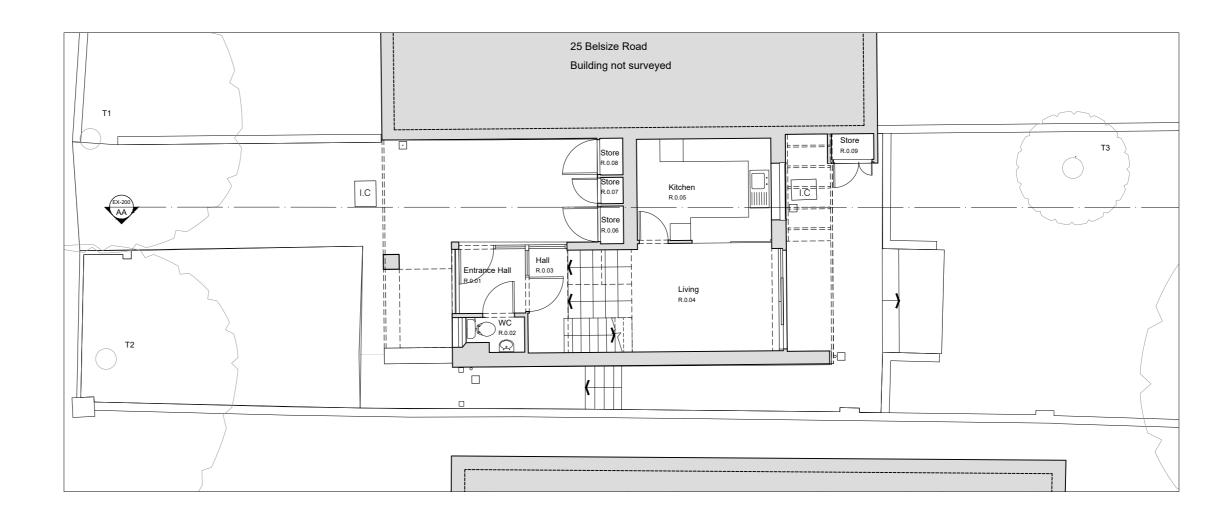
Existing Ground Floor Plan - Scale 1:100 @ A3
